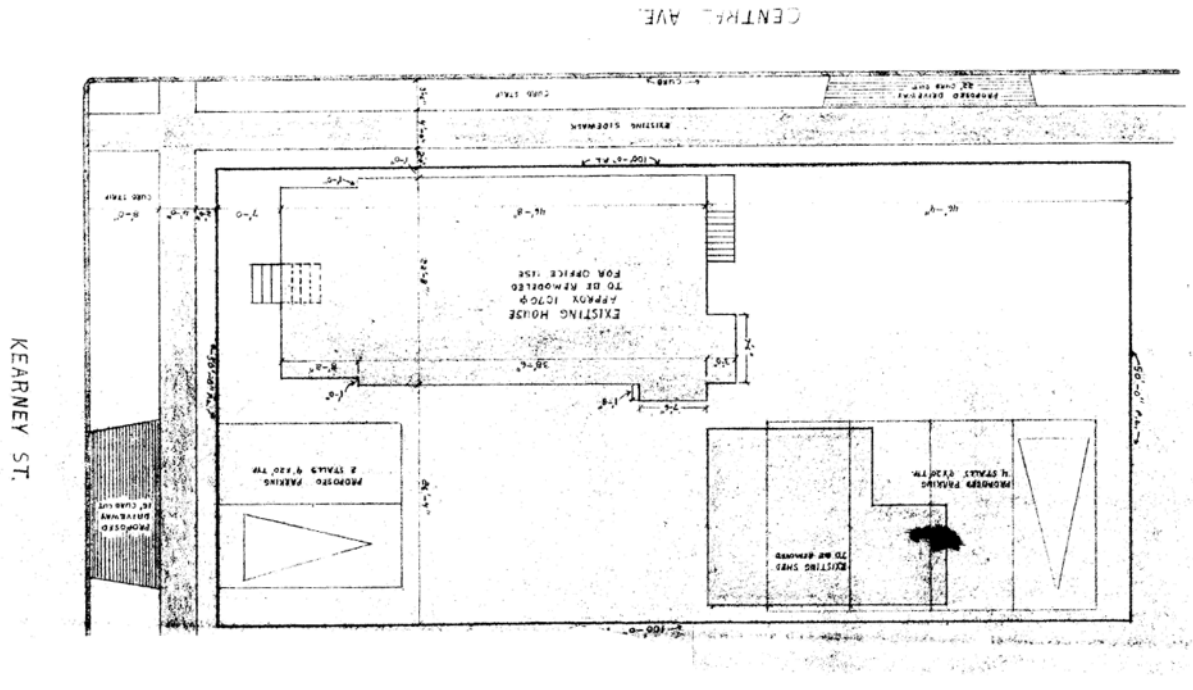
Site plan of 444 Kearney Street in 1975; the plan shows the residence and shed prior to the conversion of the property from residential to office use (El Cerrito Building Division).
